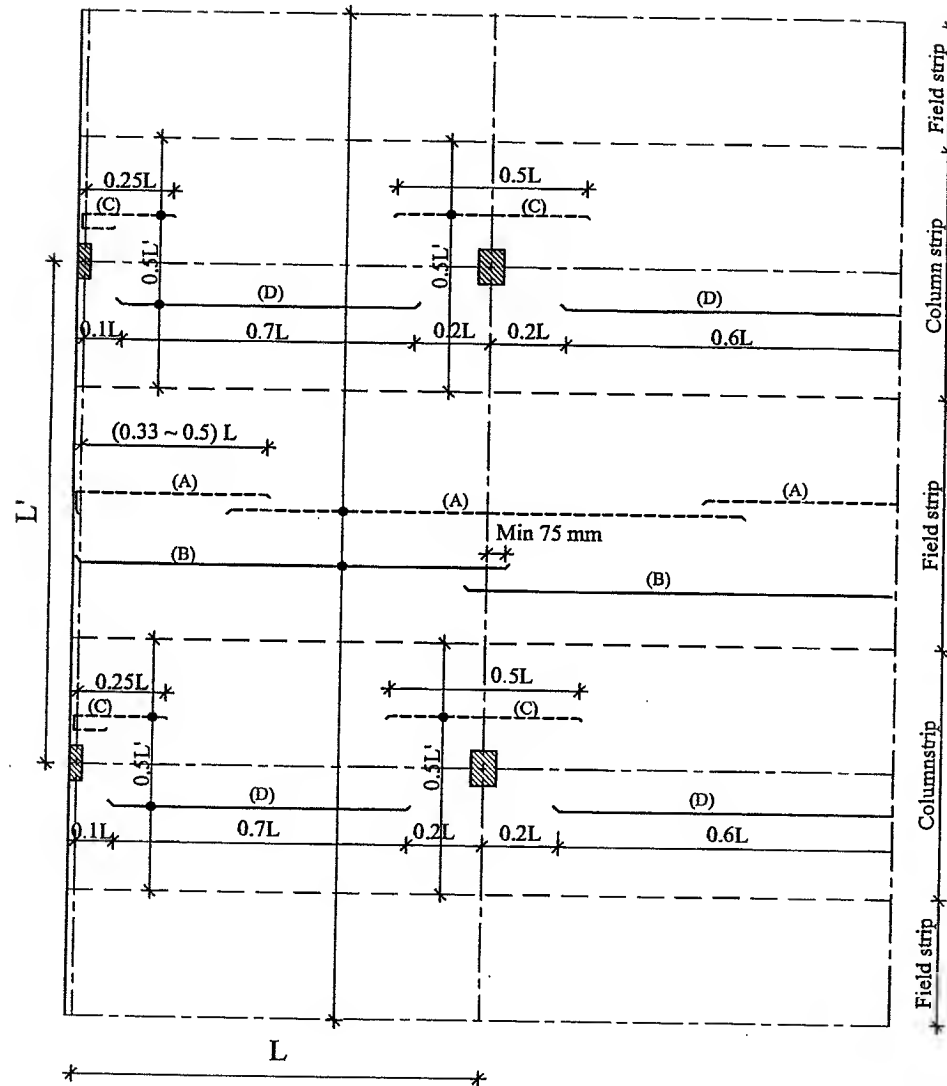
Reinforcement layout of flat slabs using mesh
